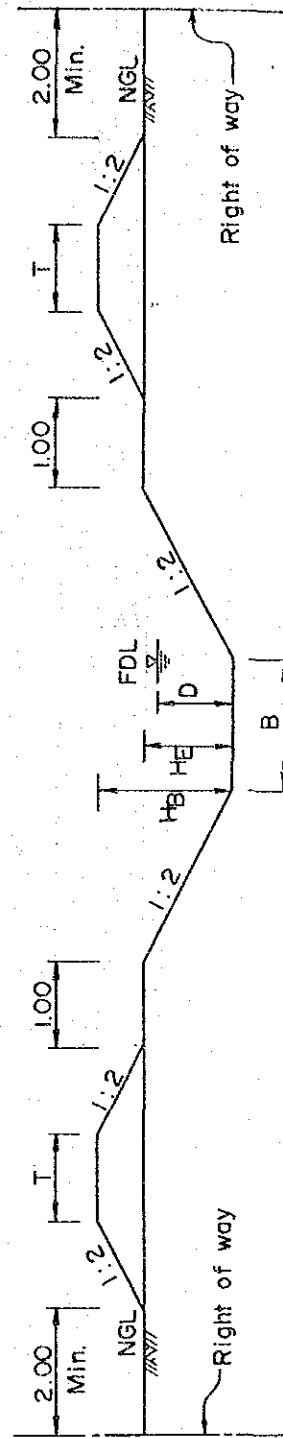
TYPICAL CROSS SECTION OF LINED CANAL
